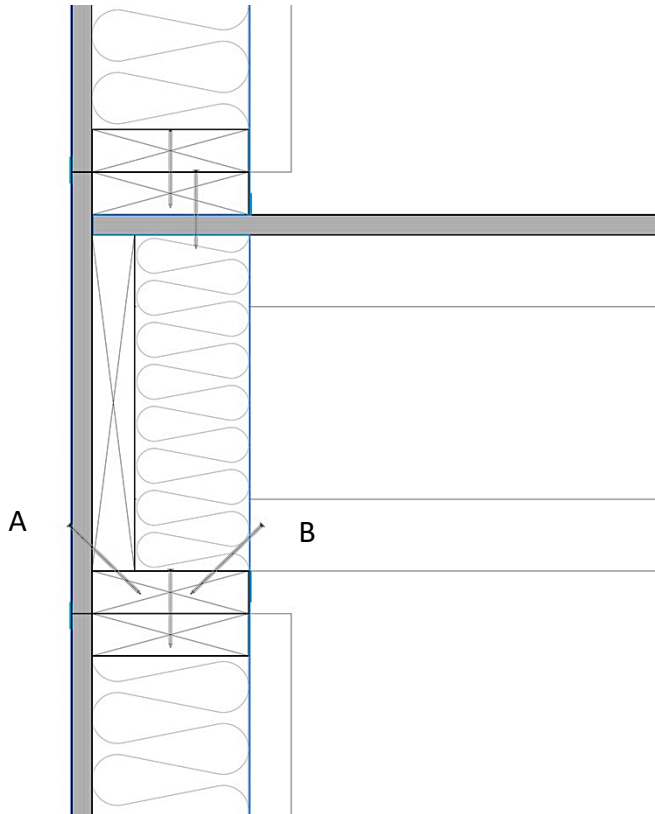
Floor panel to wall panel connection: toenail joist header to head binder (A) and toenail joist chord to head binder (B)
